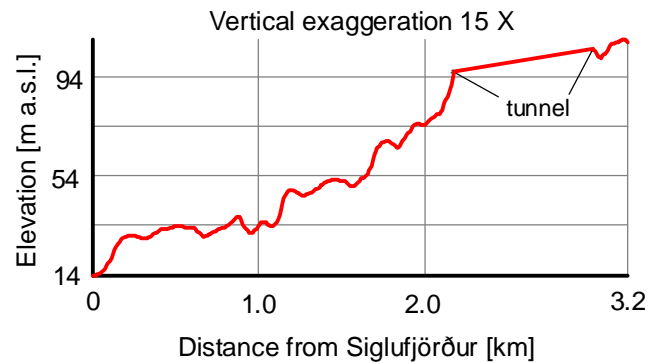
Vertical section of road section 911: km 0-3.2 – Siglufjörður to the northernmost point of road no 76
